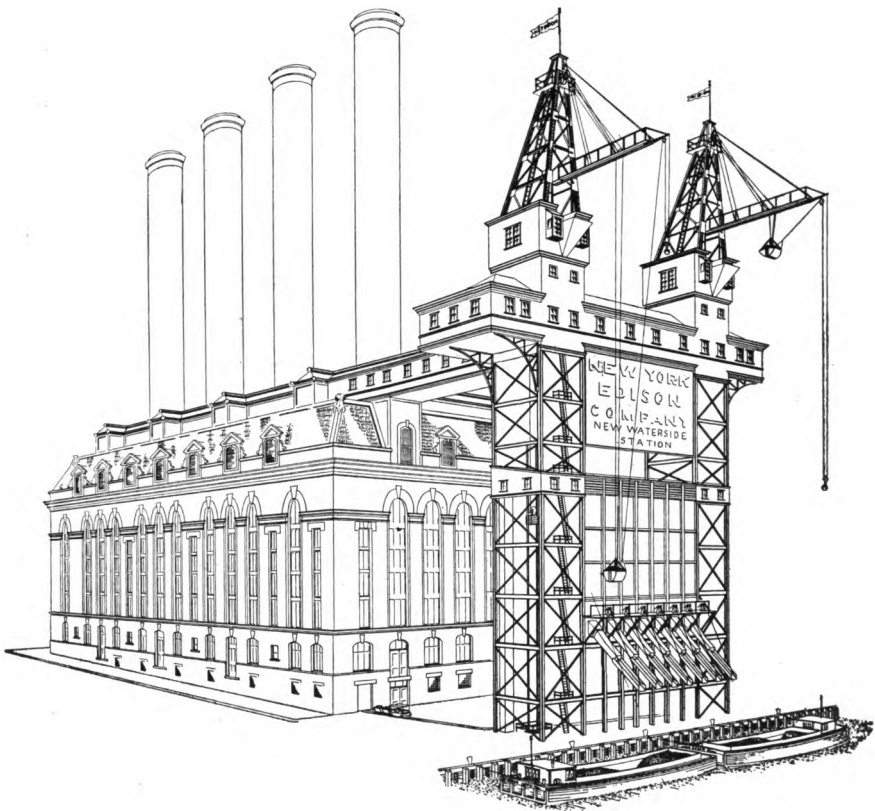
Coal Handling Machinery, Waterside No. 2.
